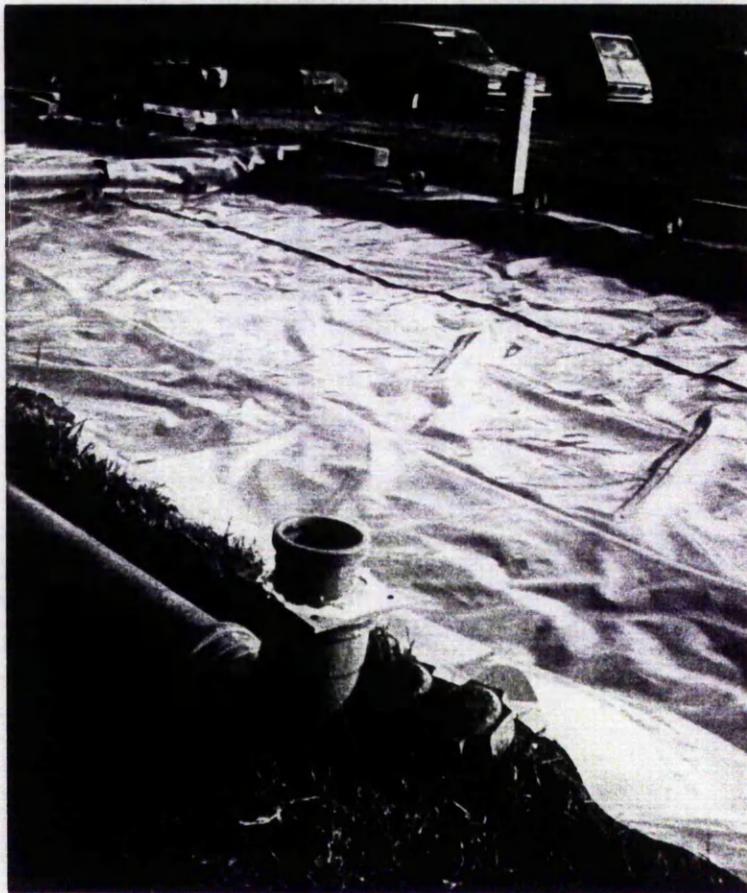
Arrangement of perforated pipe, reducer and plastic plates before installation.
